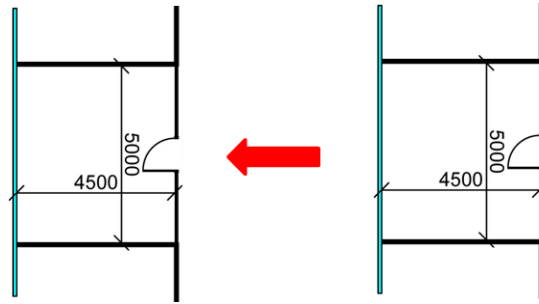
Renovating with a flat façade of an office room toward the West.
